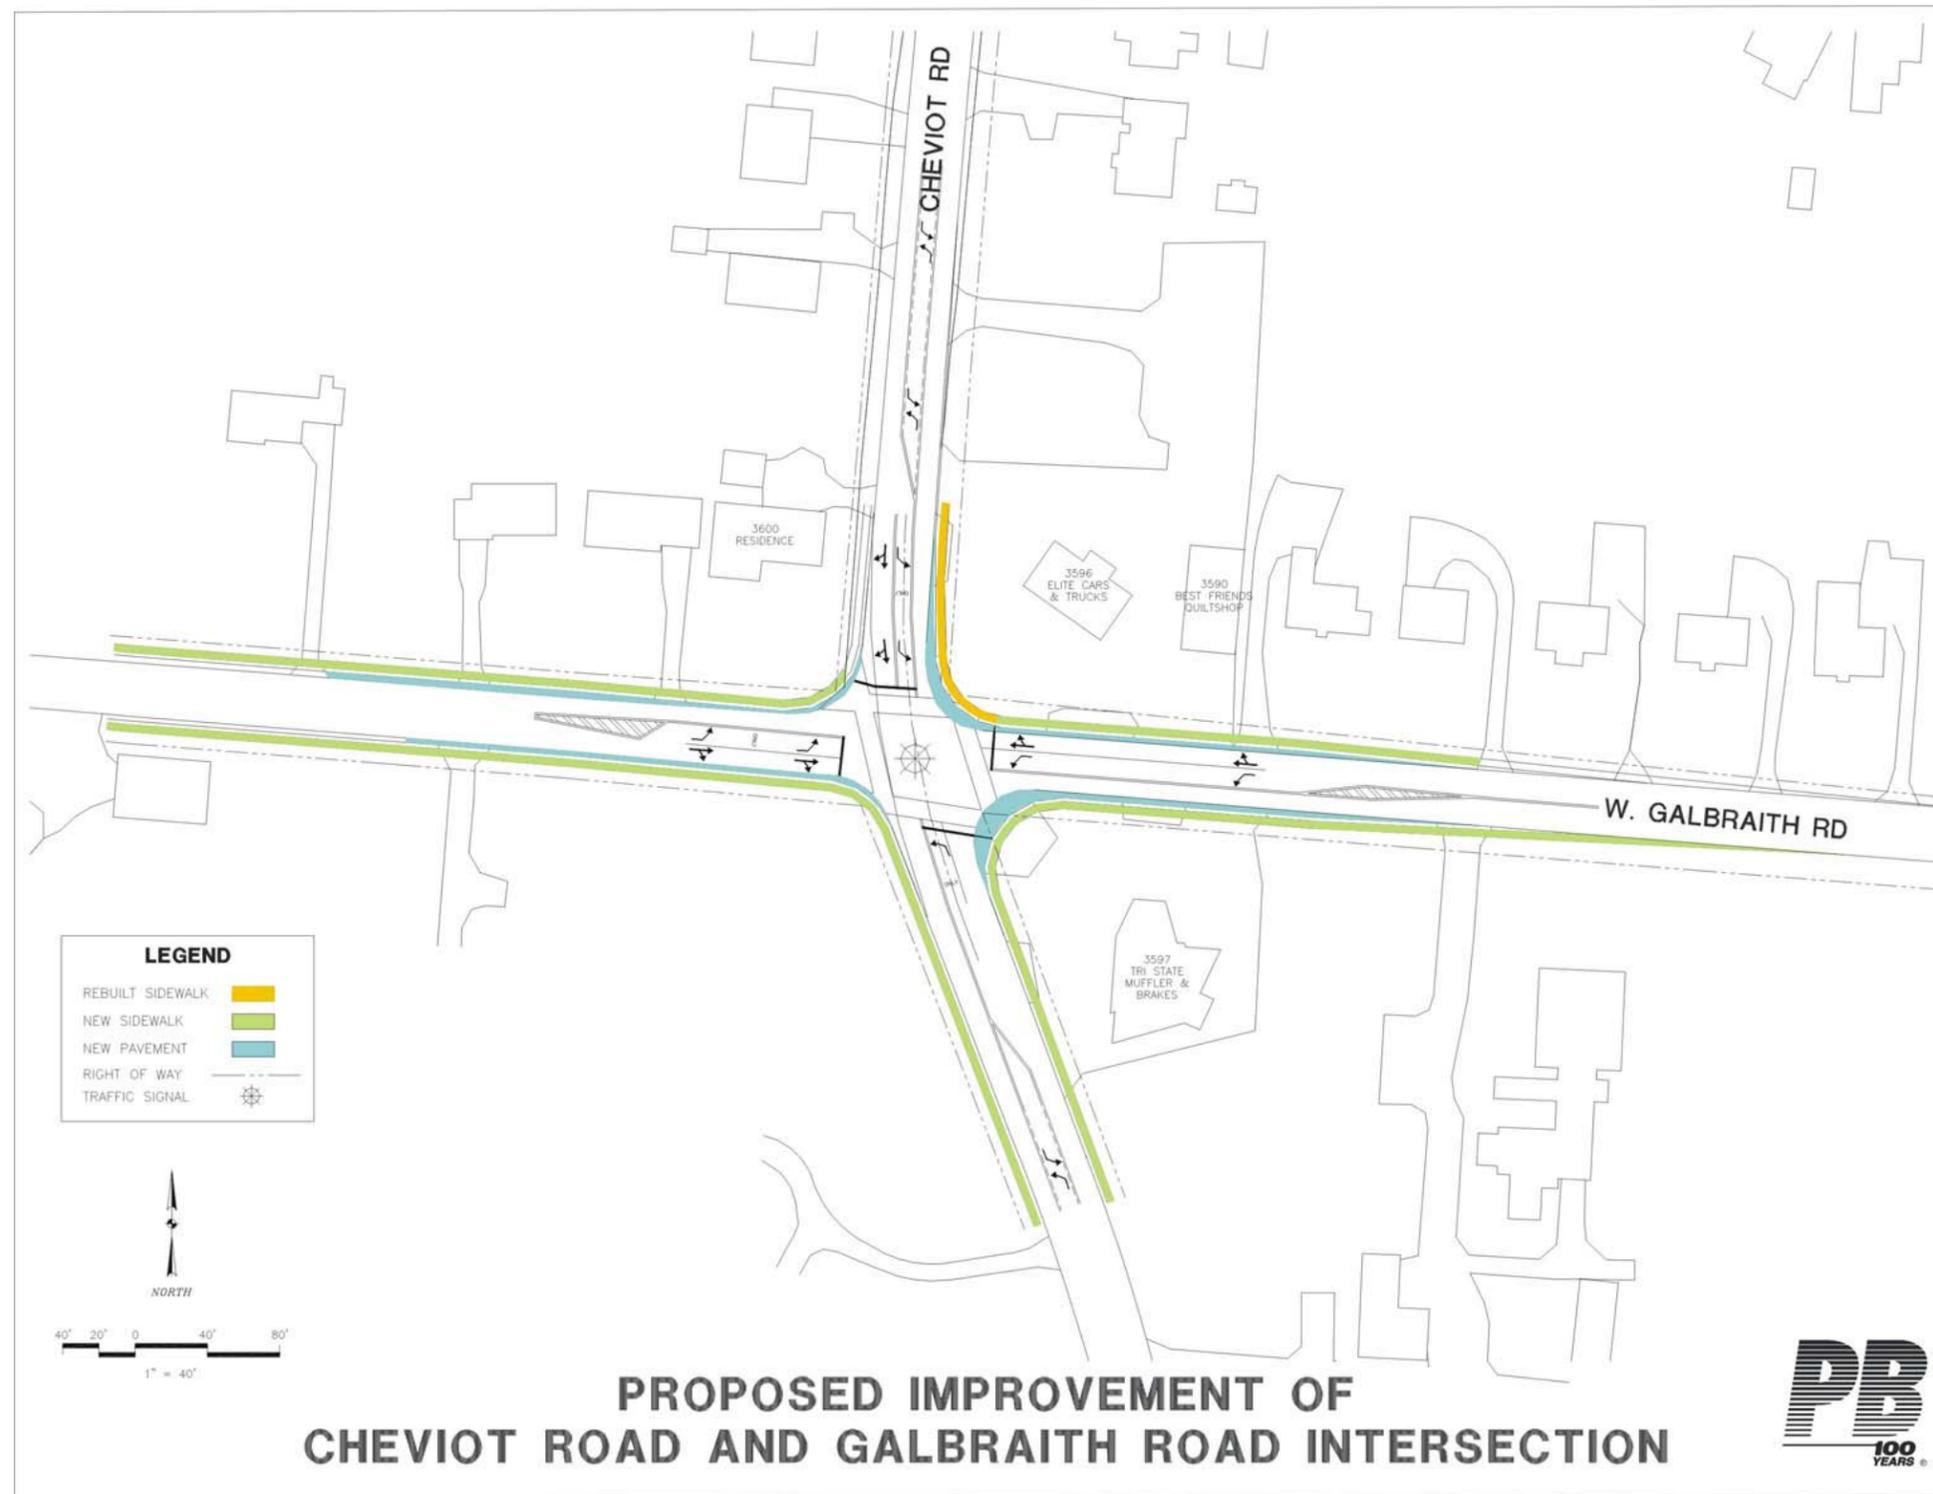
Proposed Improvement of Cheviot Road and Galbraith Road Intersection.
